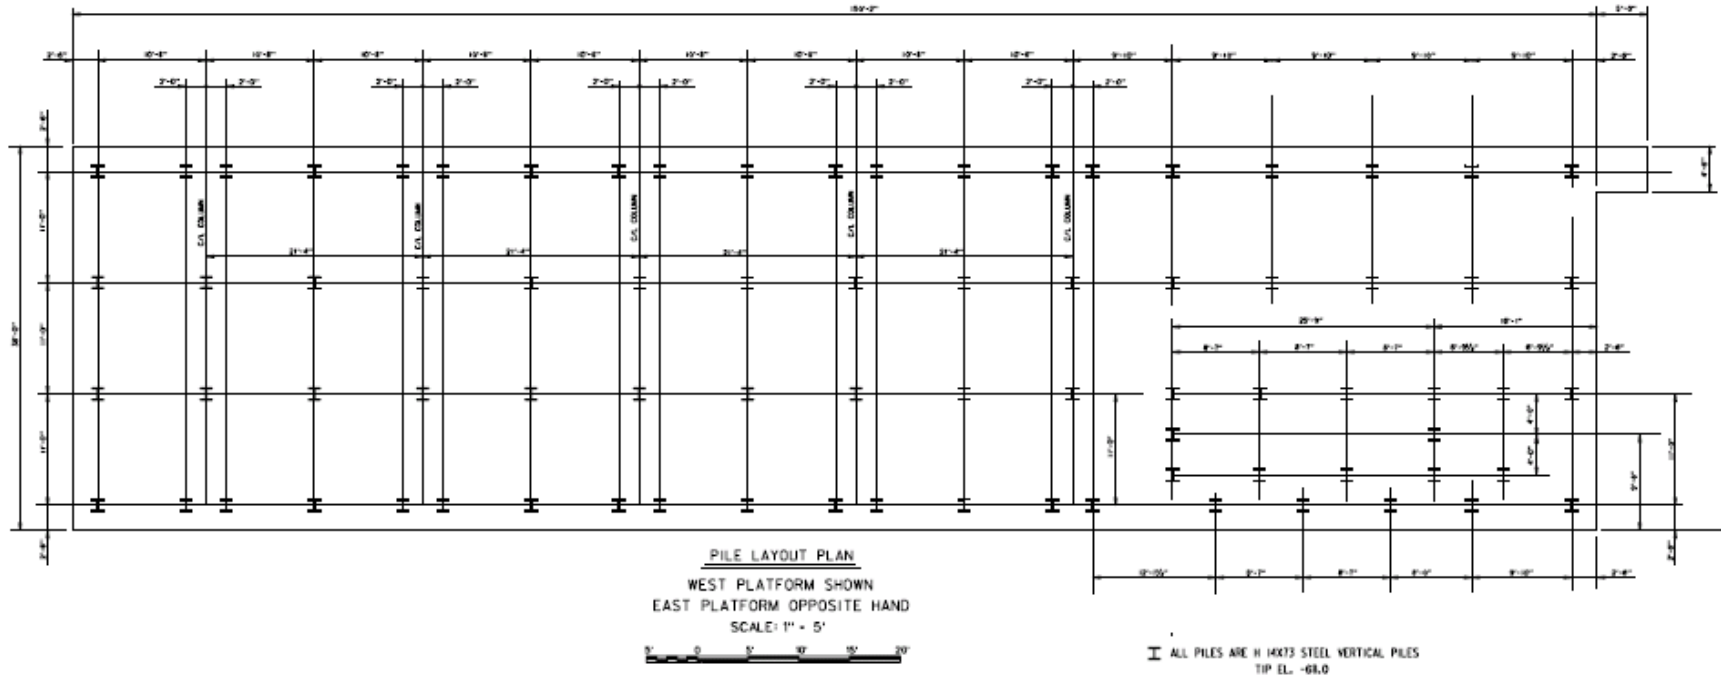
London Avenue Phase 1 Engine Platform Pile Plan
